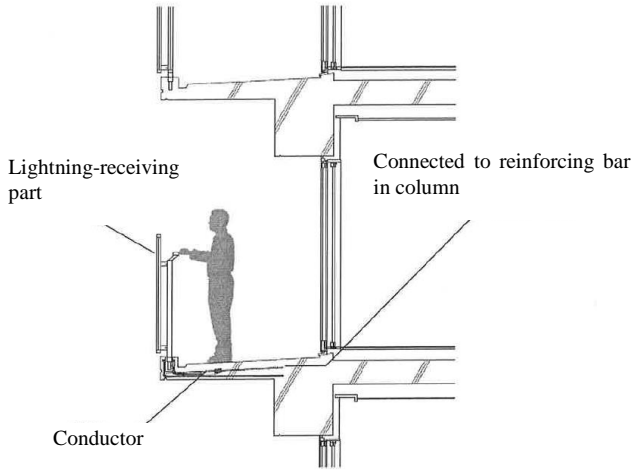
Conceptual figure for lightning protection on sidewall (using handrail)
